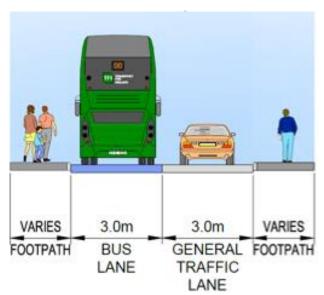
Section 2, Proposed Option 1 - Cross Section B-B
